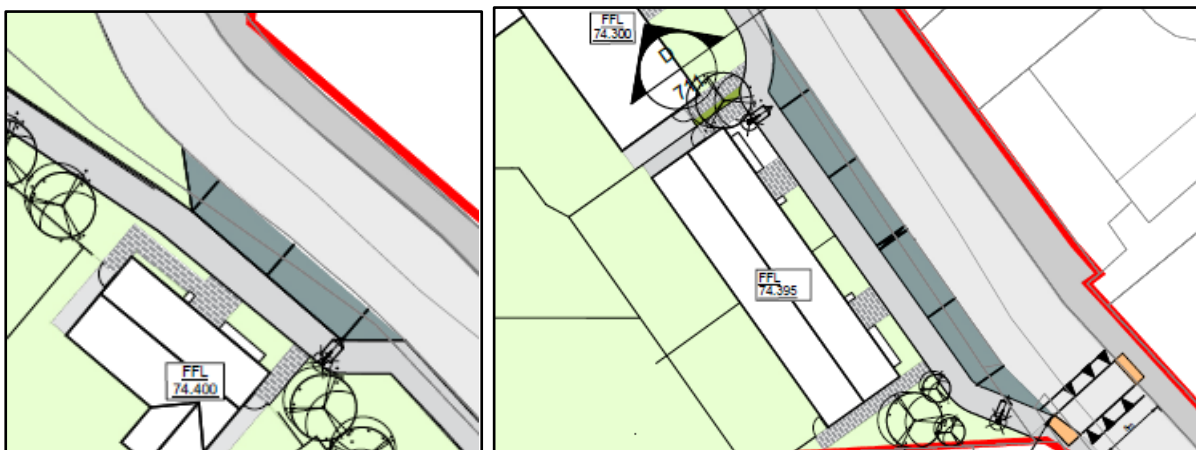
On-street parallel parking accessed from the existing road (Source: ORS Drawing 241139-ORS-ZZ-00-DR-TR-700)
